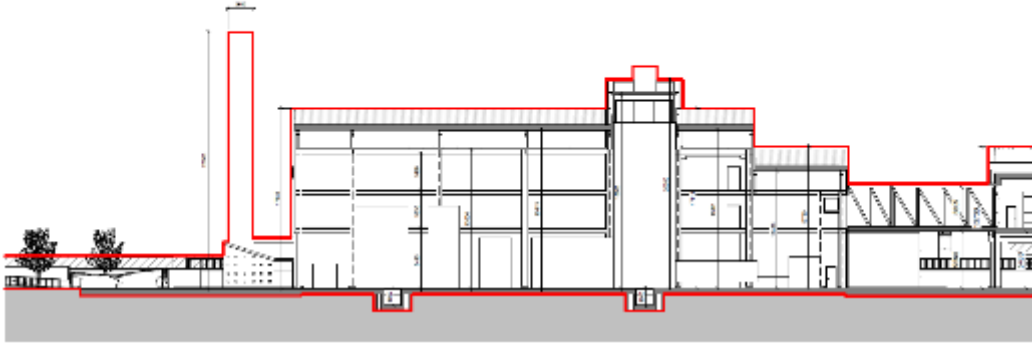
CROSS-SECTION VIEW OF THE PROPOSED BUILDING DESIGN
